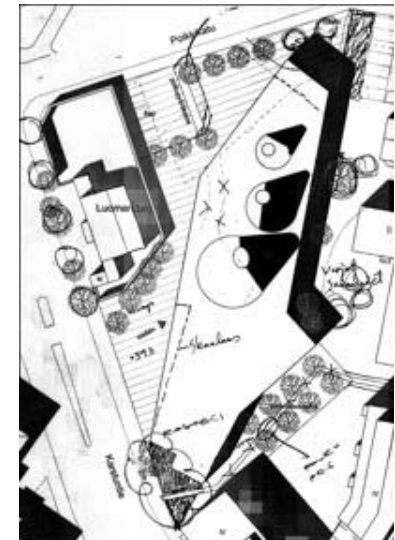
Lahdelma's proposal with architect's corrections (site plan).
